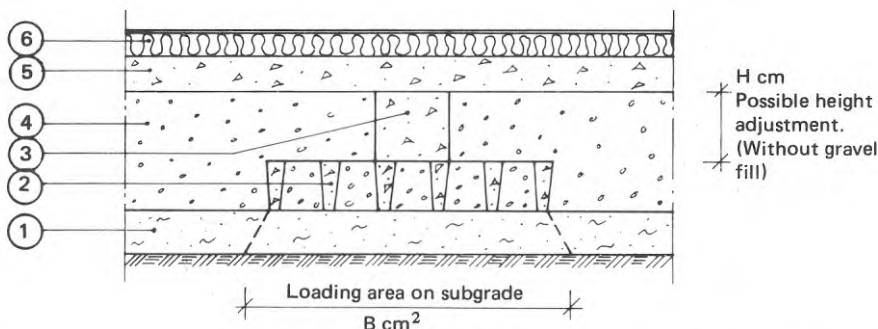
Basic principles for positioning of the grid. 1. Drainage and reinforcement. 2. Prefabricated concrete grid. 3. Footing pedestal anchored in grid and floor slab. 4. Pea gravel, 4–8 mm. 5. Floor slab of in-situ cast concrete. When lifting the jacks were inserted under the floor slab which is reinforced with beams. 6. Insulation and floor covering.
